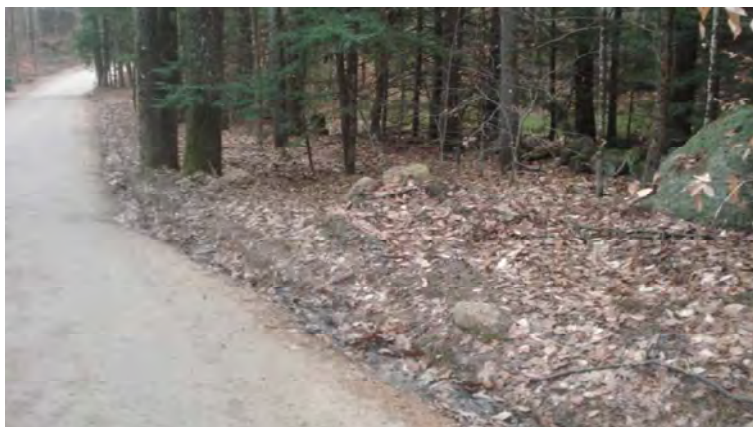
Kaulback Road, Looking South, Proposed Turn-Out Location (BMP 24)
